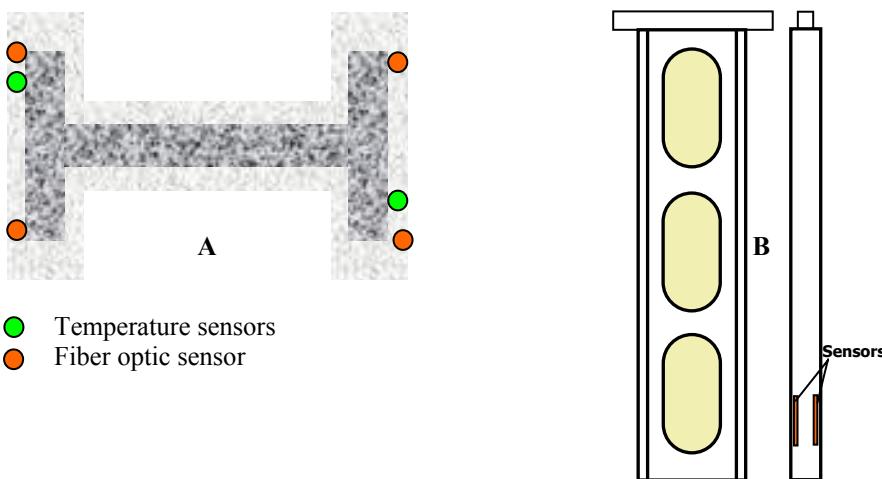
Sensor position on the bridge columns – A - cross section, B - Front and side view
